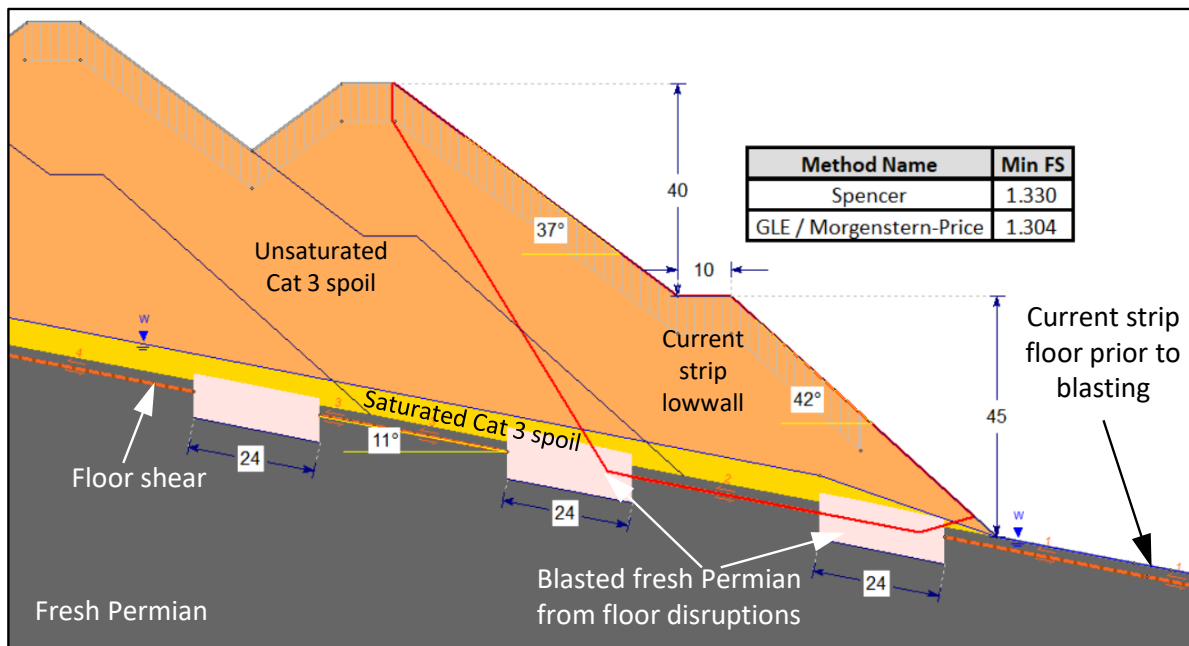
Shear below floor observed from a floor disruption blasting induced dragline lowwall failure in one of the northern pits.
